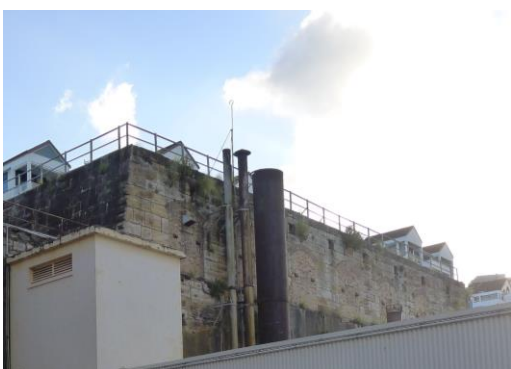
View of east elevation of Coal Stores above Submarine School- proposed location of cantilevered walkway.
